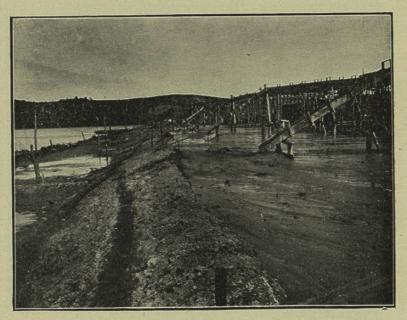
Upper Toe Filling on the Santo Amaro Hydraulic-fill Dam, Brazil, showing Lateral Flumes.
